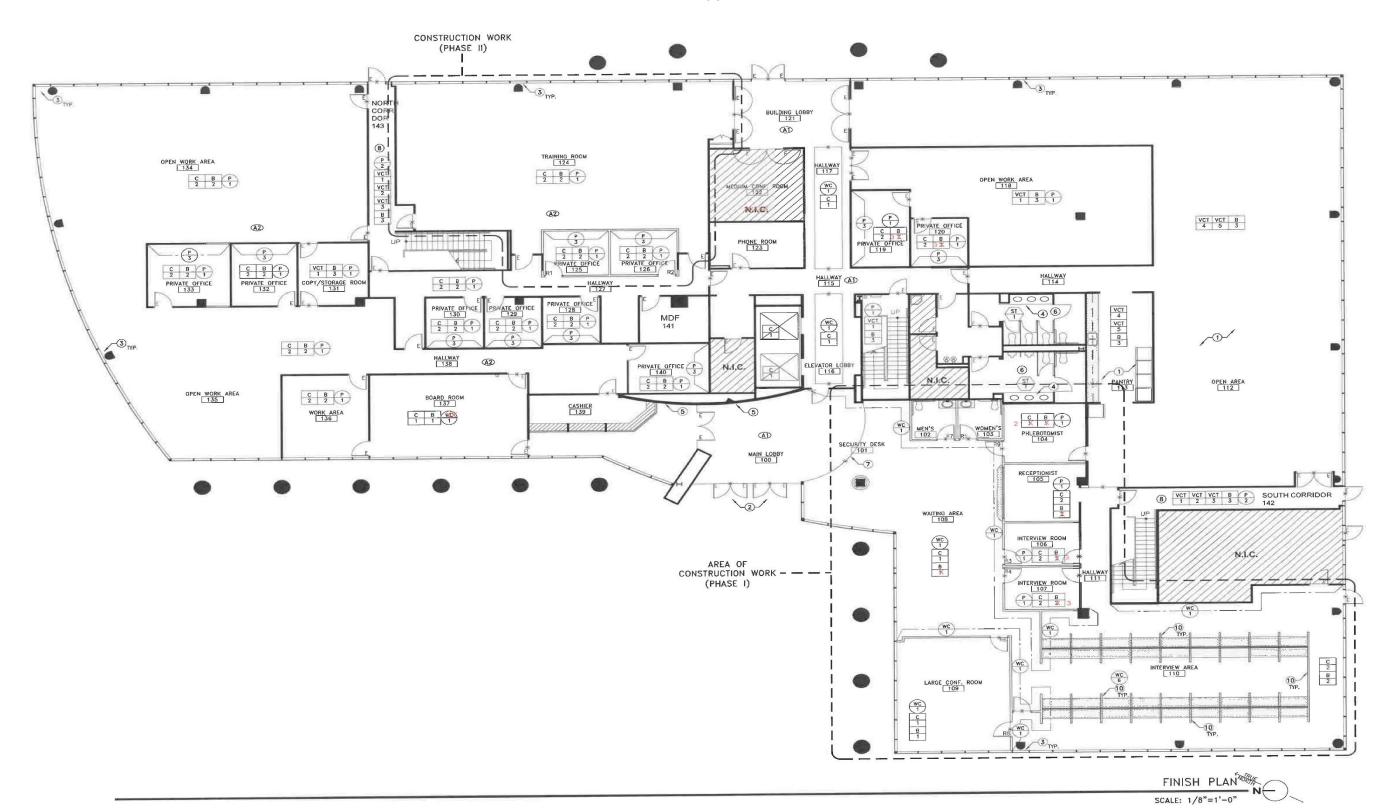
" Depiction Premises Flooring and Painting Plan Second Floor
